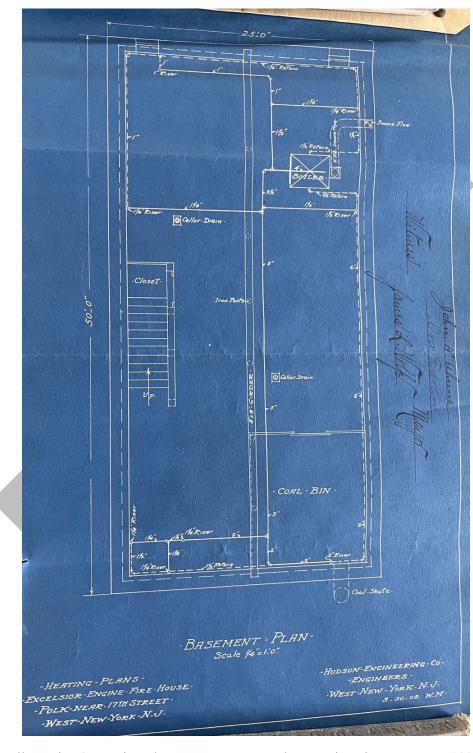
Heating Plans - Basement – Hudson Engineering Company, 1908 Complements of the Town of West New York
